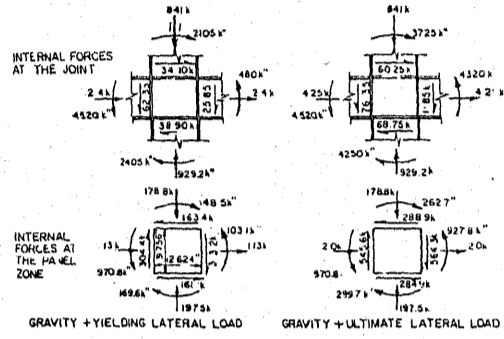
INTERNAL FORCES AT JOINT AND AT PANEL ZONE
